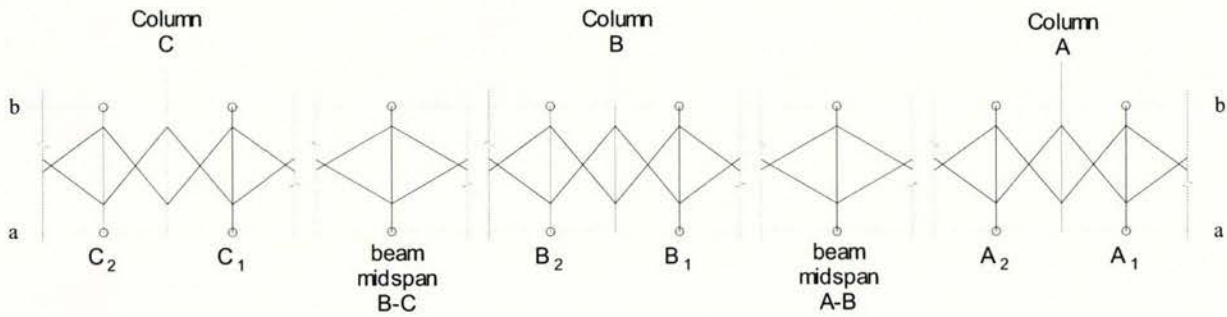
Points of differential vertical movement of floor slab between perimeter frame beam and first prestressed floor rib.
